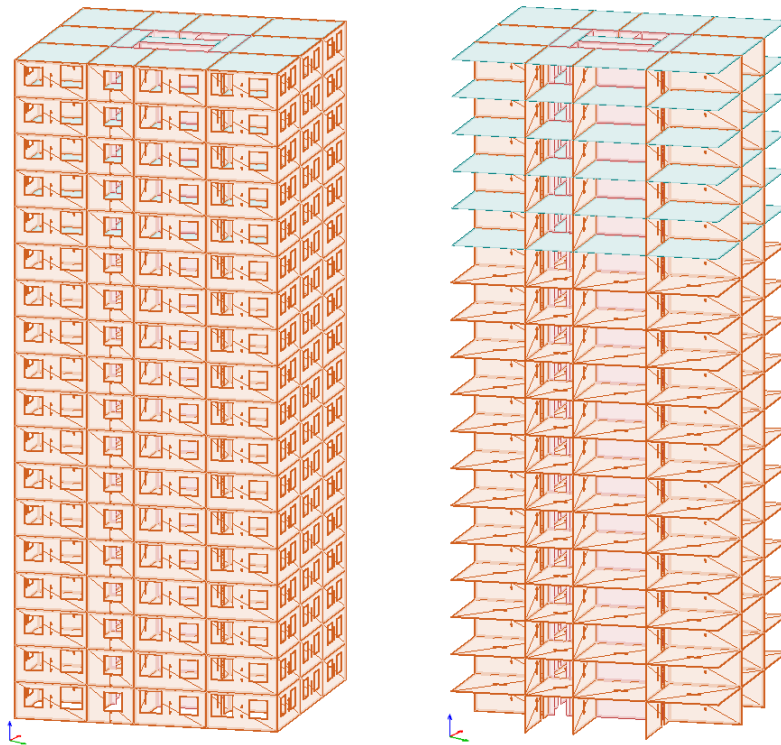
Hybrid timber building with concrete floors at upper part of building and a concrete core extending along the buildings height.
